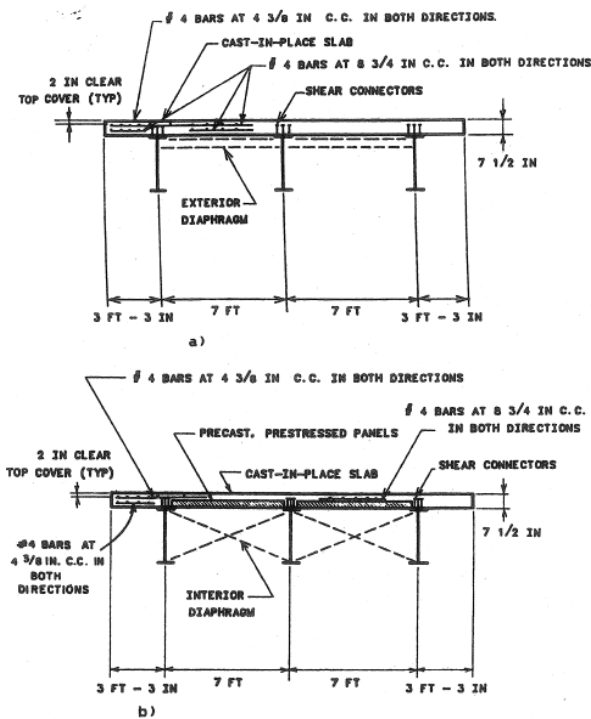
Cross Sections of Test Specimen: a) Cast-In-Place Deck and
